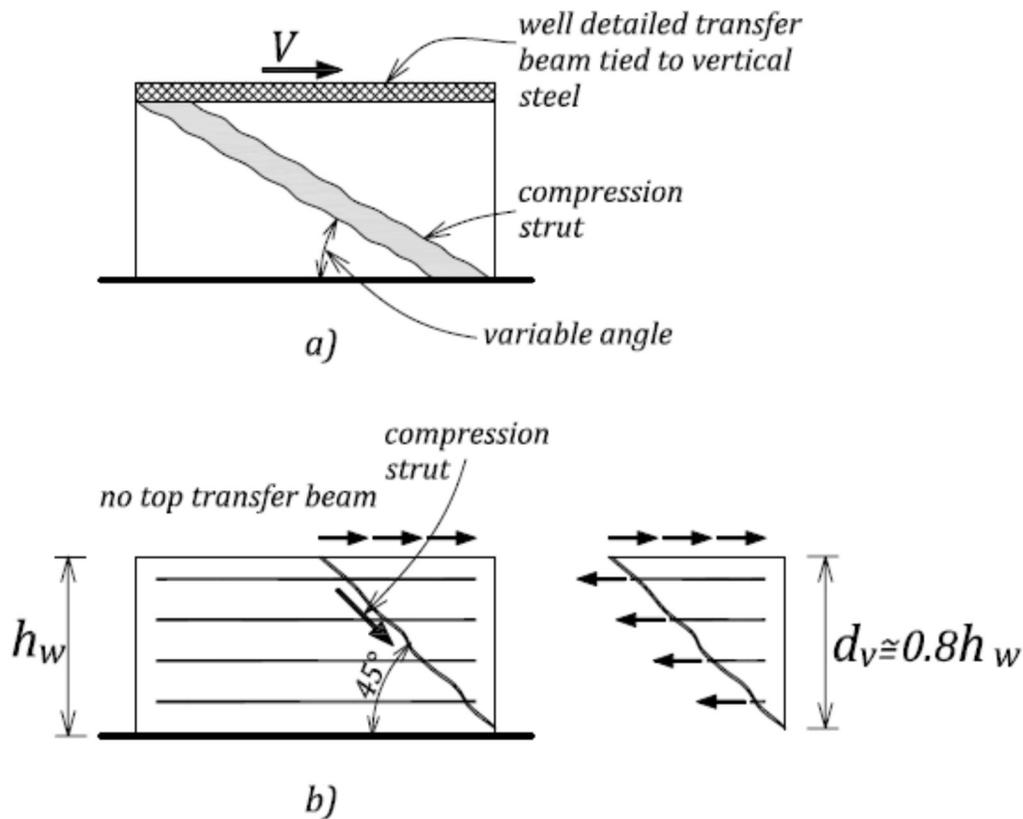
Shear failure mechanisms in squat shear walls: a) wall with the top transfer beam – a desirable failure mechanism; b) partial failure of a squat wall without the top beam.
